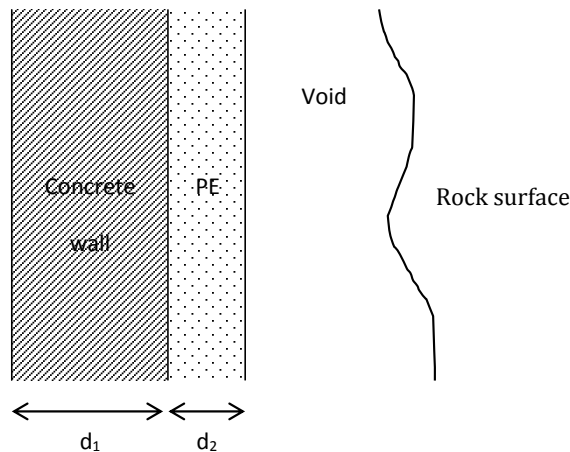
Cross-section of an inner lining of pre-cast segments of concrete with PE-foam for insulation
